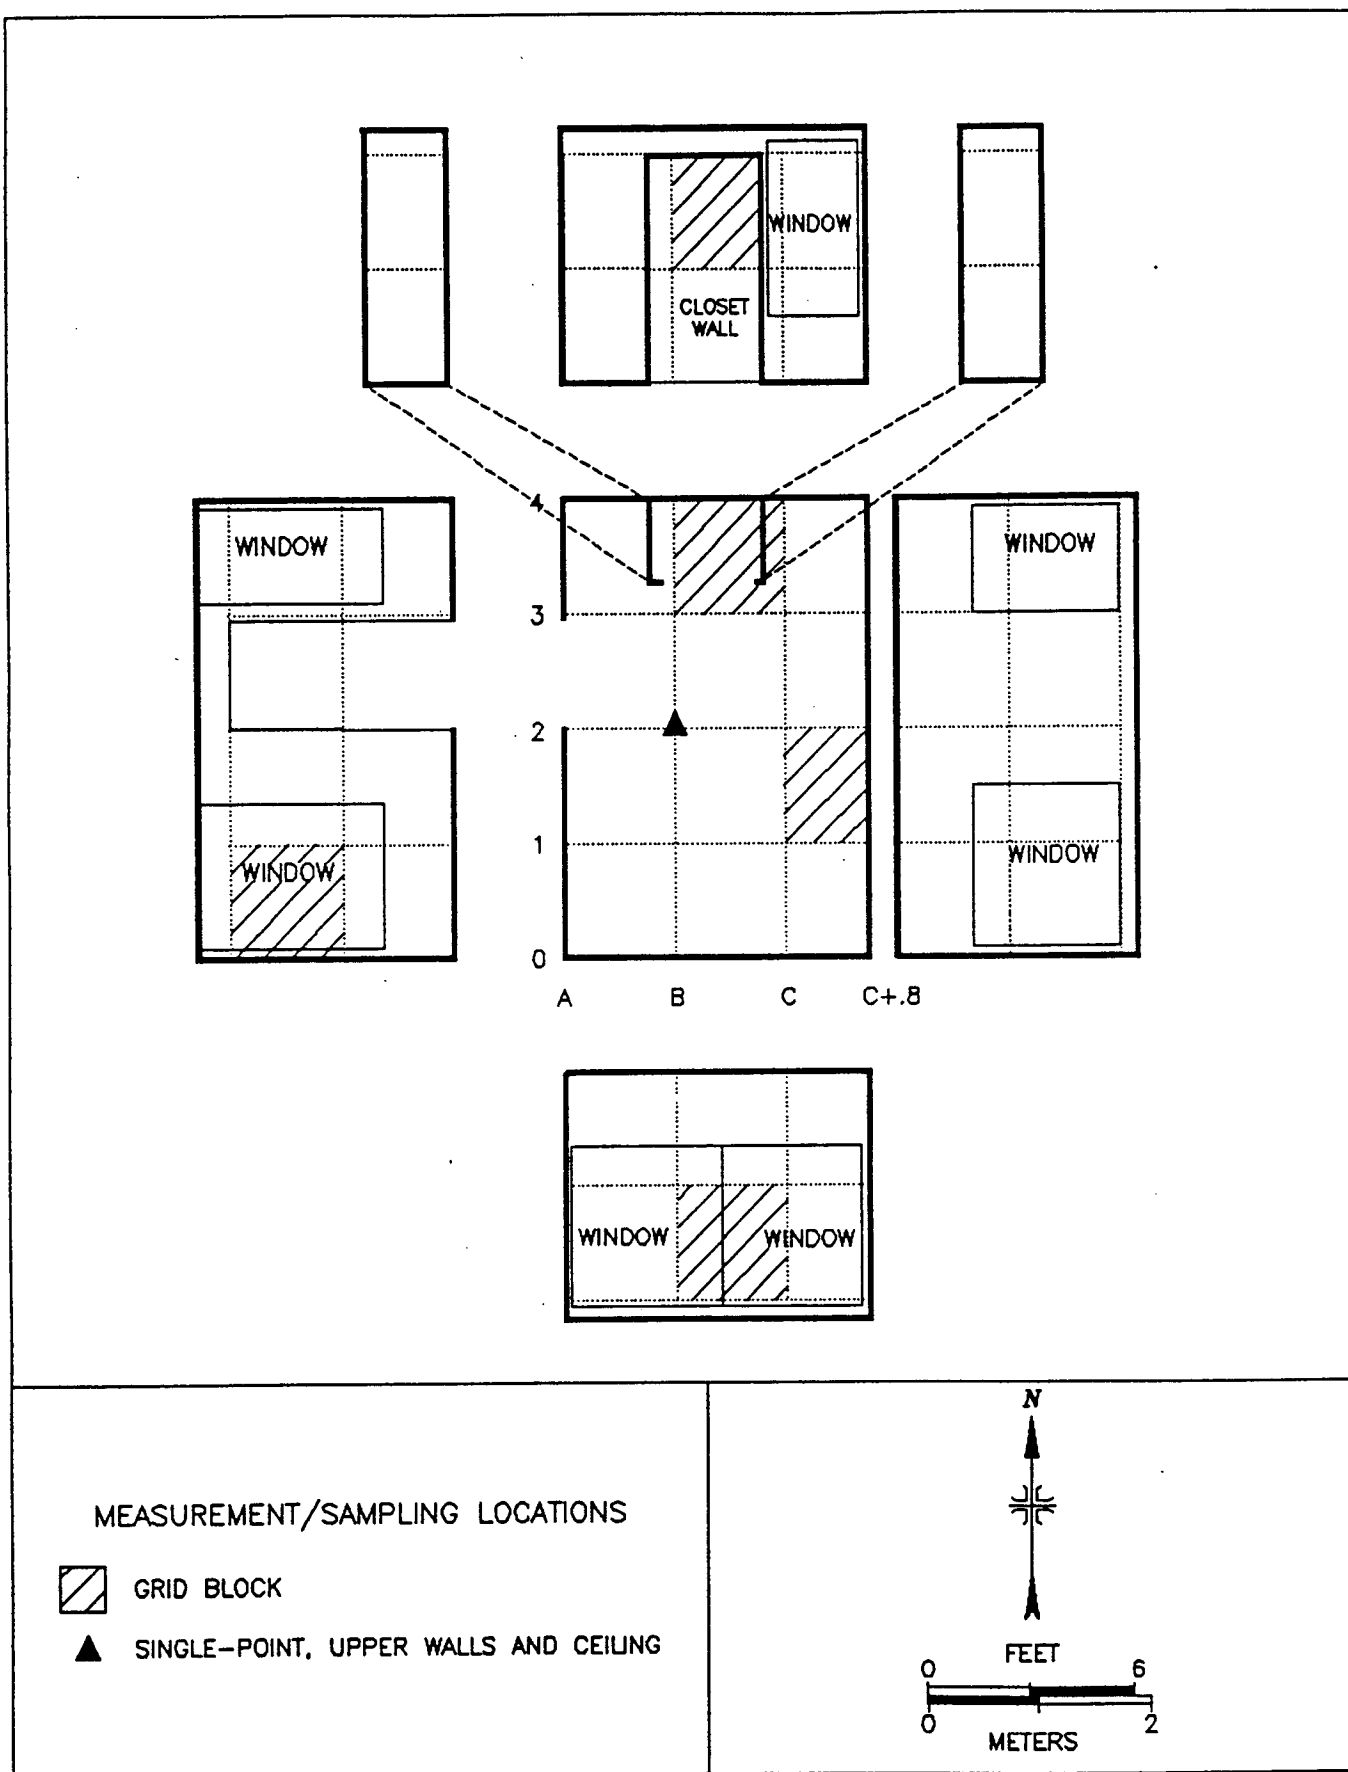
Building 416, Guard House – Measurement and Sampling Locations
